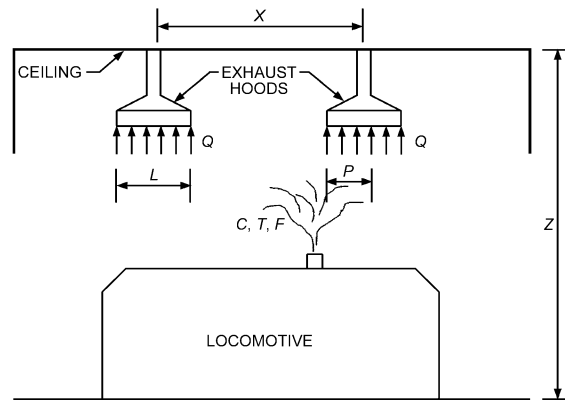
Elevation View of Locomotive and Exhaust Hood System
